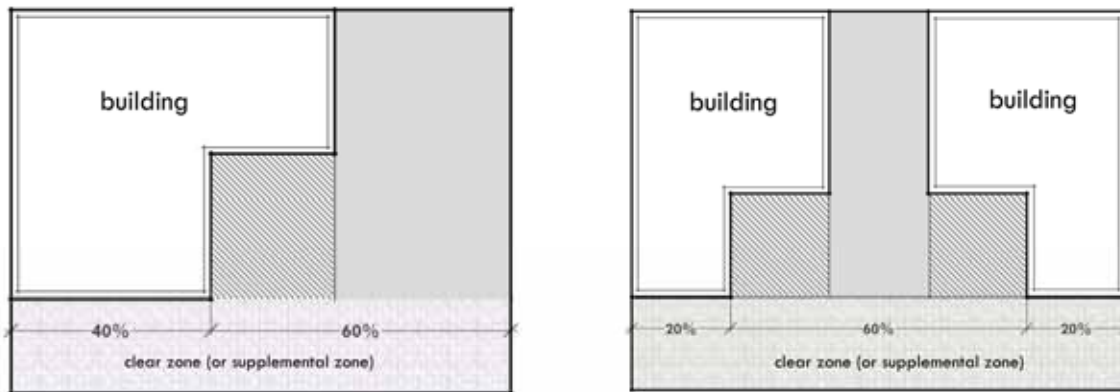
Sample illustrations meeting the net frontage building requirement along a TOD Local Street (no parking allowed in hatched area).
